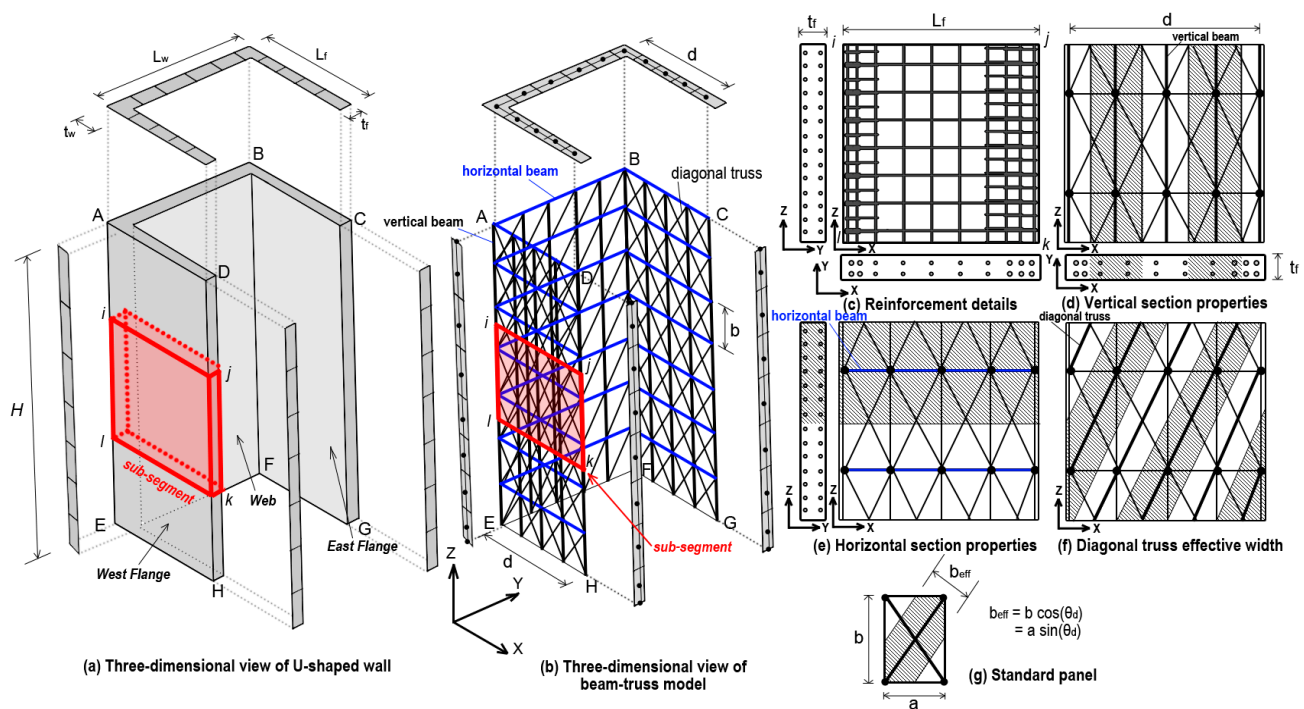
Schematic illustration of the beam-truss model approach for a U-shaped wall (adapted from Lu et al. [23] and modified for the wall section of interest for this work).
